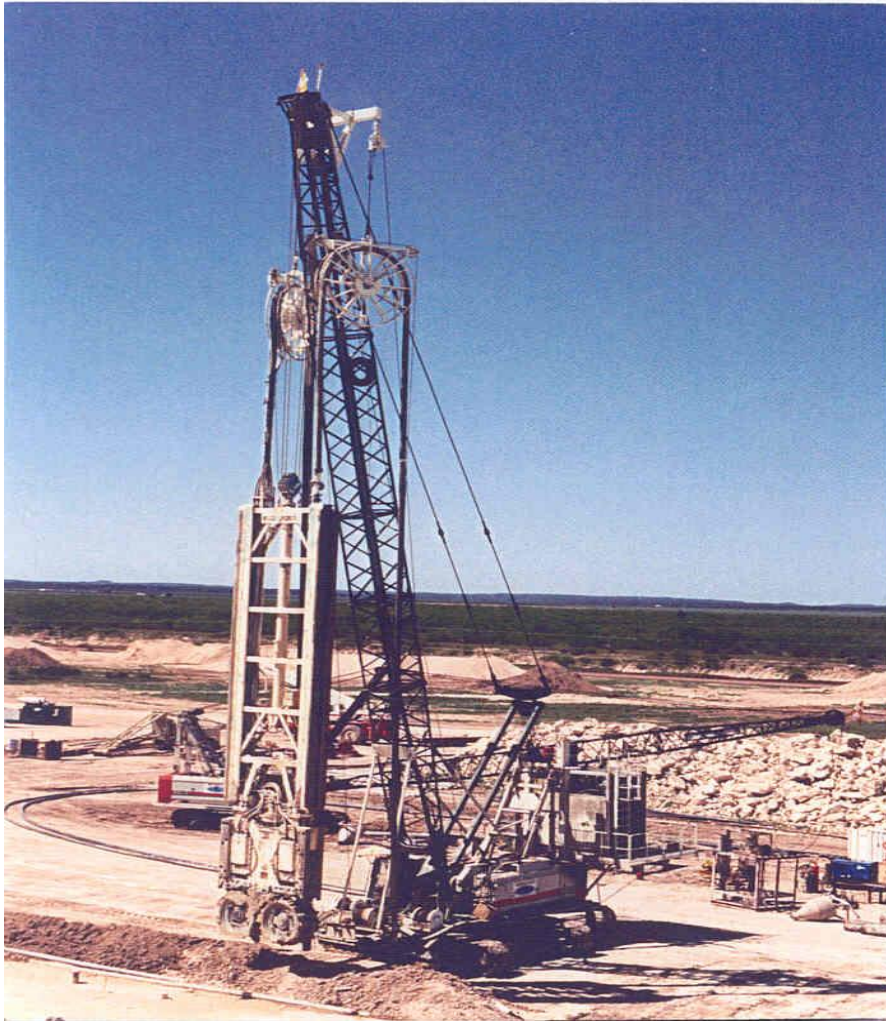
Rockmill used for the SCB cutoff wall excavation (Twin Buttes Dam, Texas).
